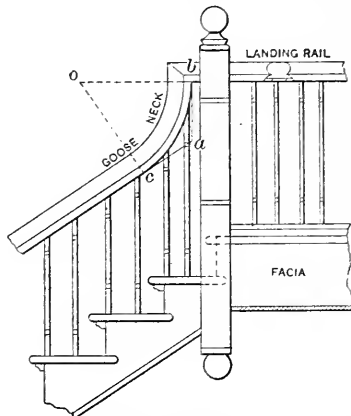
Partial Elevation of the Landing Newel, Landing Rail and Goose Neck on the Pitch Rail.
